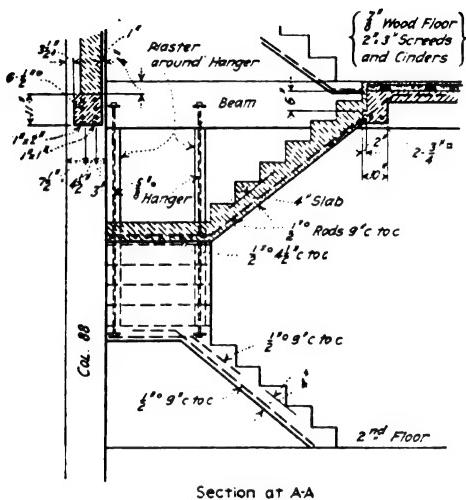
Stair details, factory building, Cambridge Building Trust.
